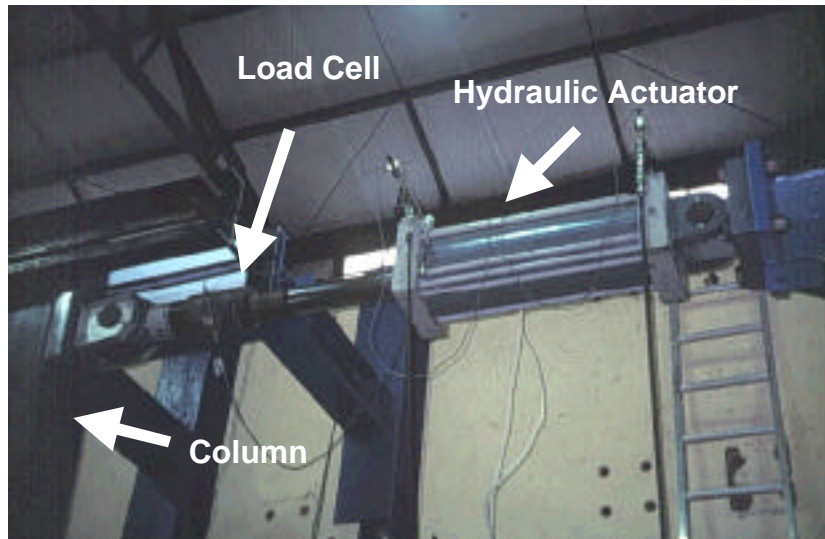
Test Setup for Full-Scale Specimens
